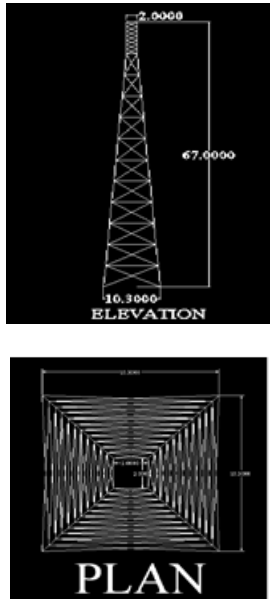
PLAN AND ELEVATION OF COMMUNICATION TOWER
